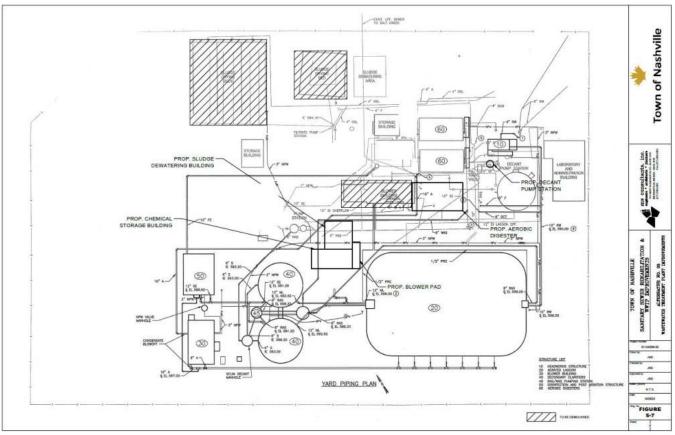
WASTEWATER TREATMENT PLANT IMPROVEMENTS
